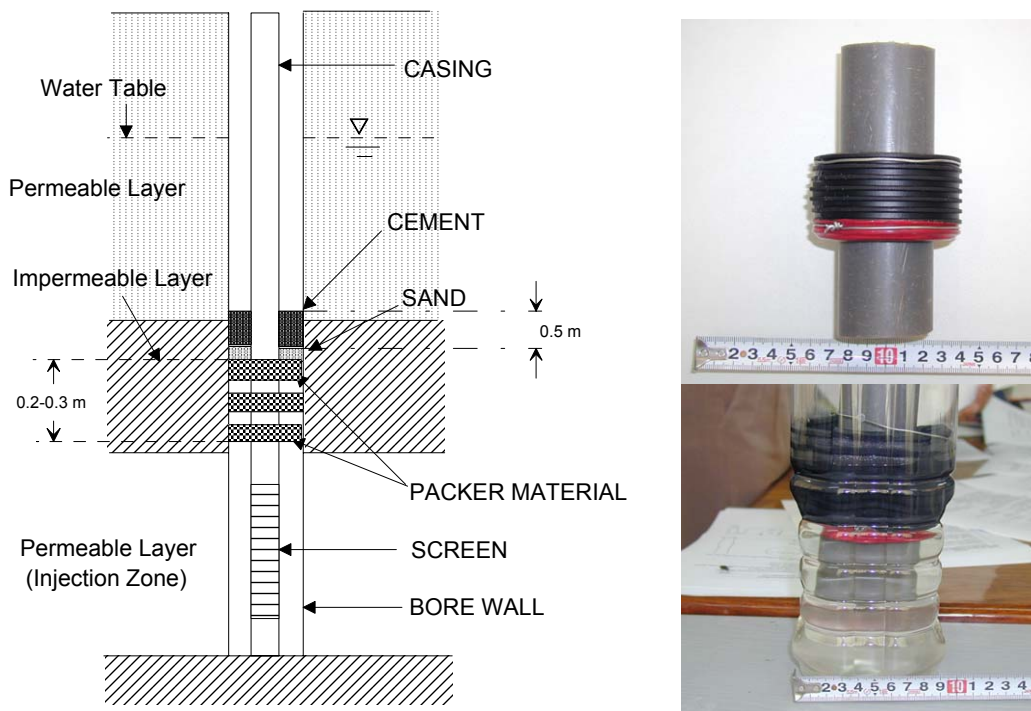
Sealing by Packer (left), Packer Material (right)
